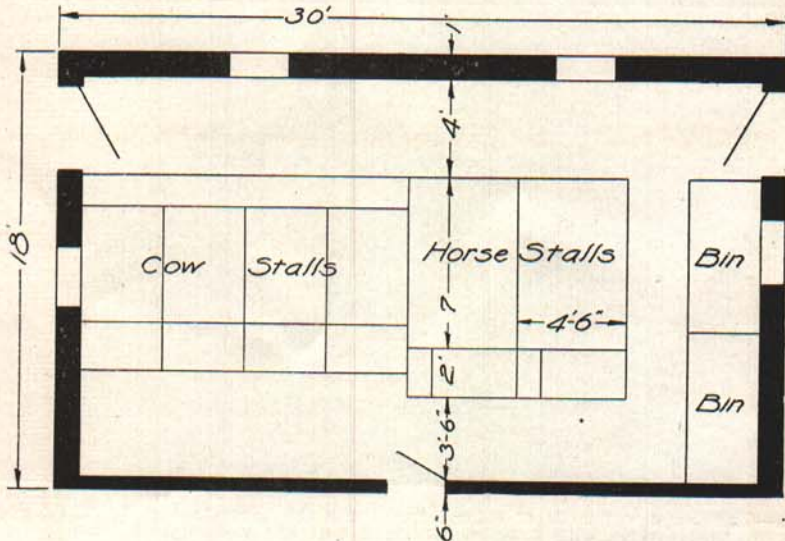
(A)—Floor plan of first section of barn, planned for later additions.
